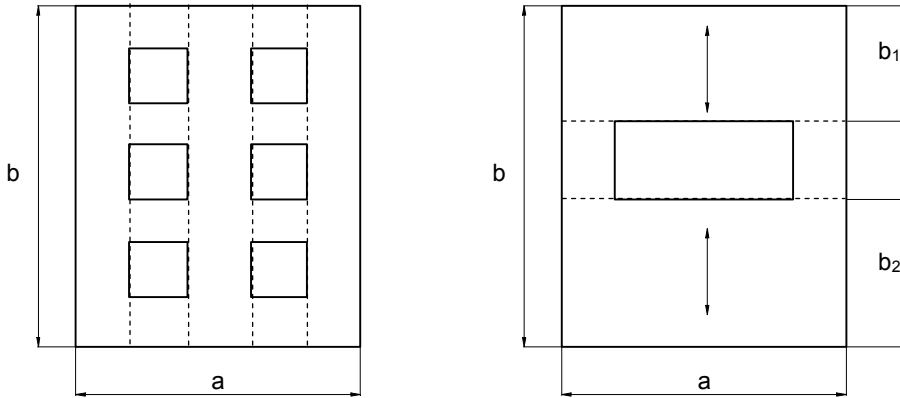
Openings in diaphragm: a) discrete openings; b) strip openings
